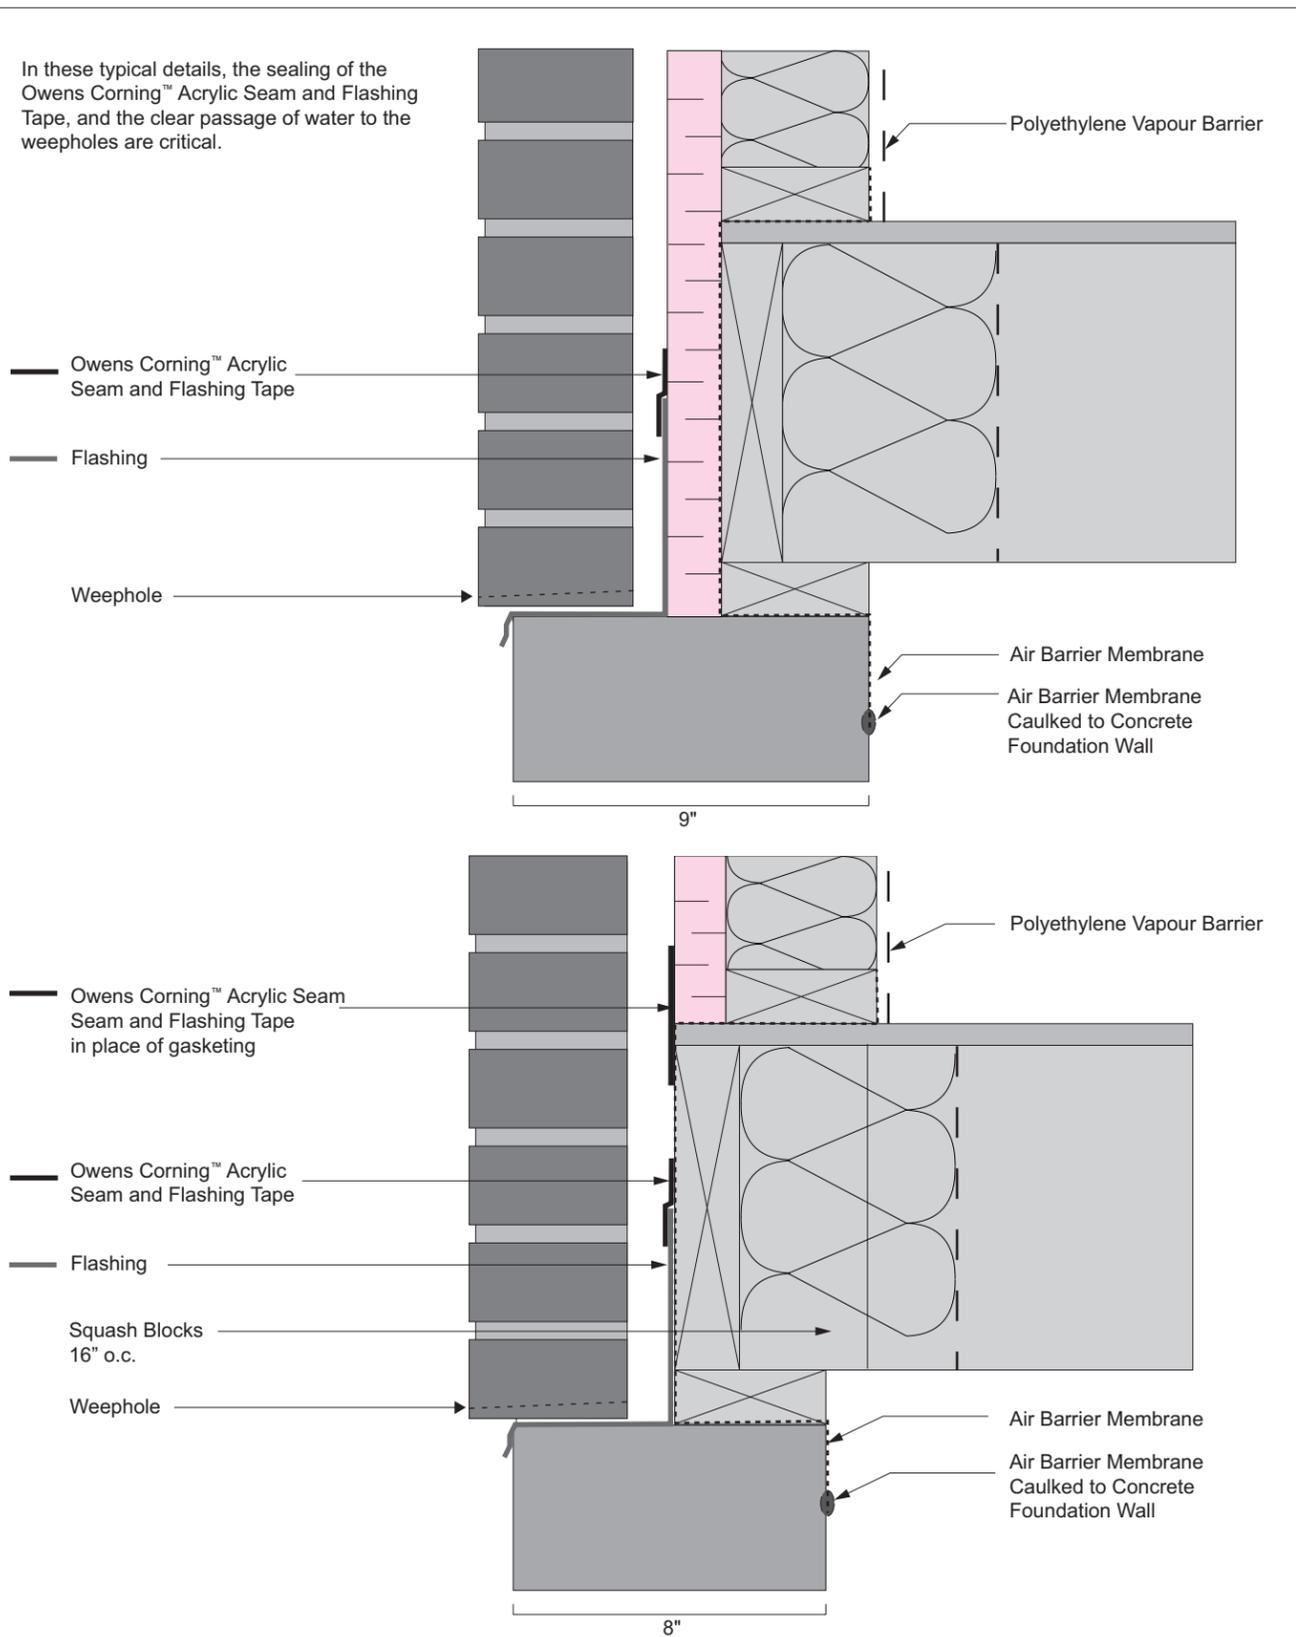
8" and 9" Foundation Wall Header Detail - Owens Corning™ Acrylic Seam and Flashing Tape and no FoamSealR™ Gaskets
